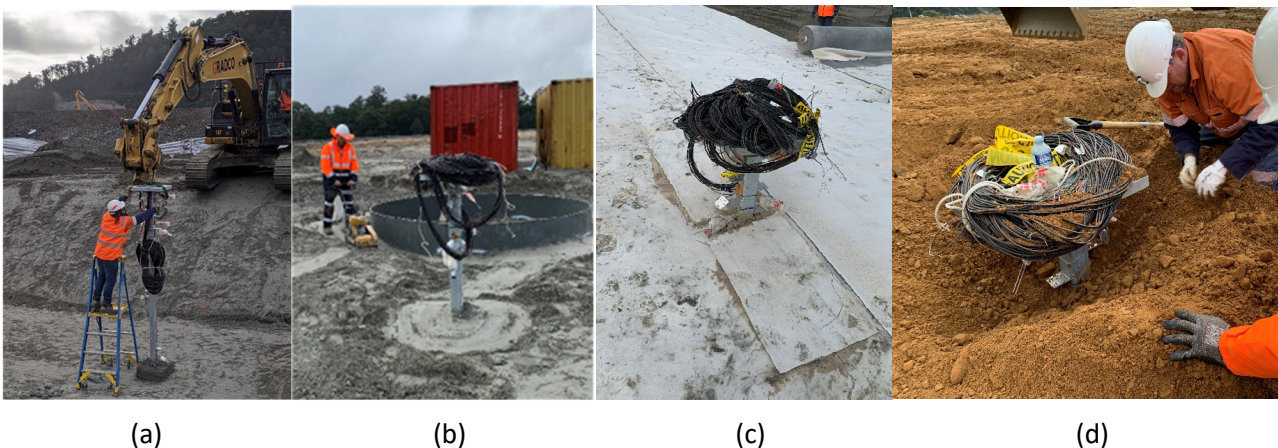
Sensor tree installation. (a) Mounting sensor tree in footing; (b) Backfilling tailings; (c) Placing GCL around sensor 'trees'; (d) 'Hand' backfilling glacial till around sensors
